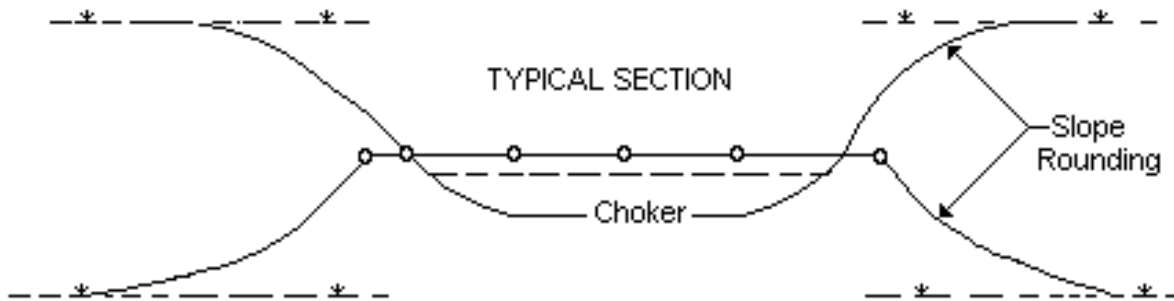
Trenched Subgrade Sections with Slope Rounding
